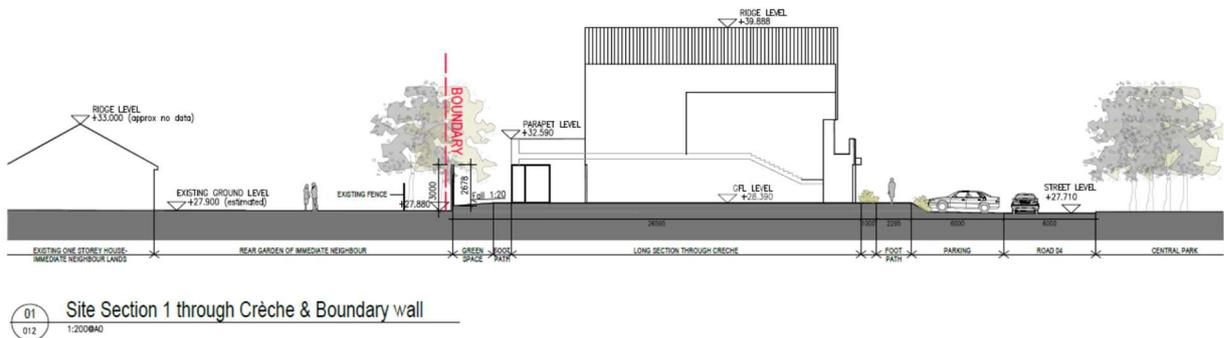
Site Section 01 taken from submitted drawing no. 6204-P012
